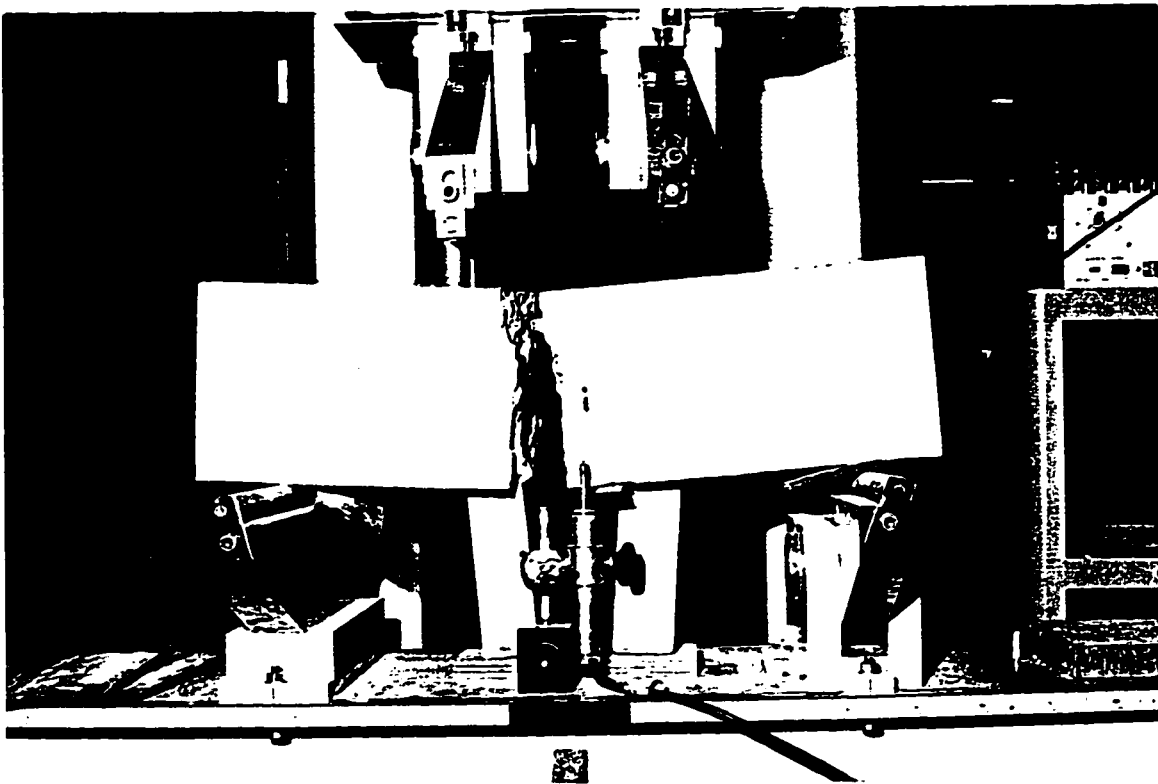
Failure of a beam specimen in flexure under third point loading test.
